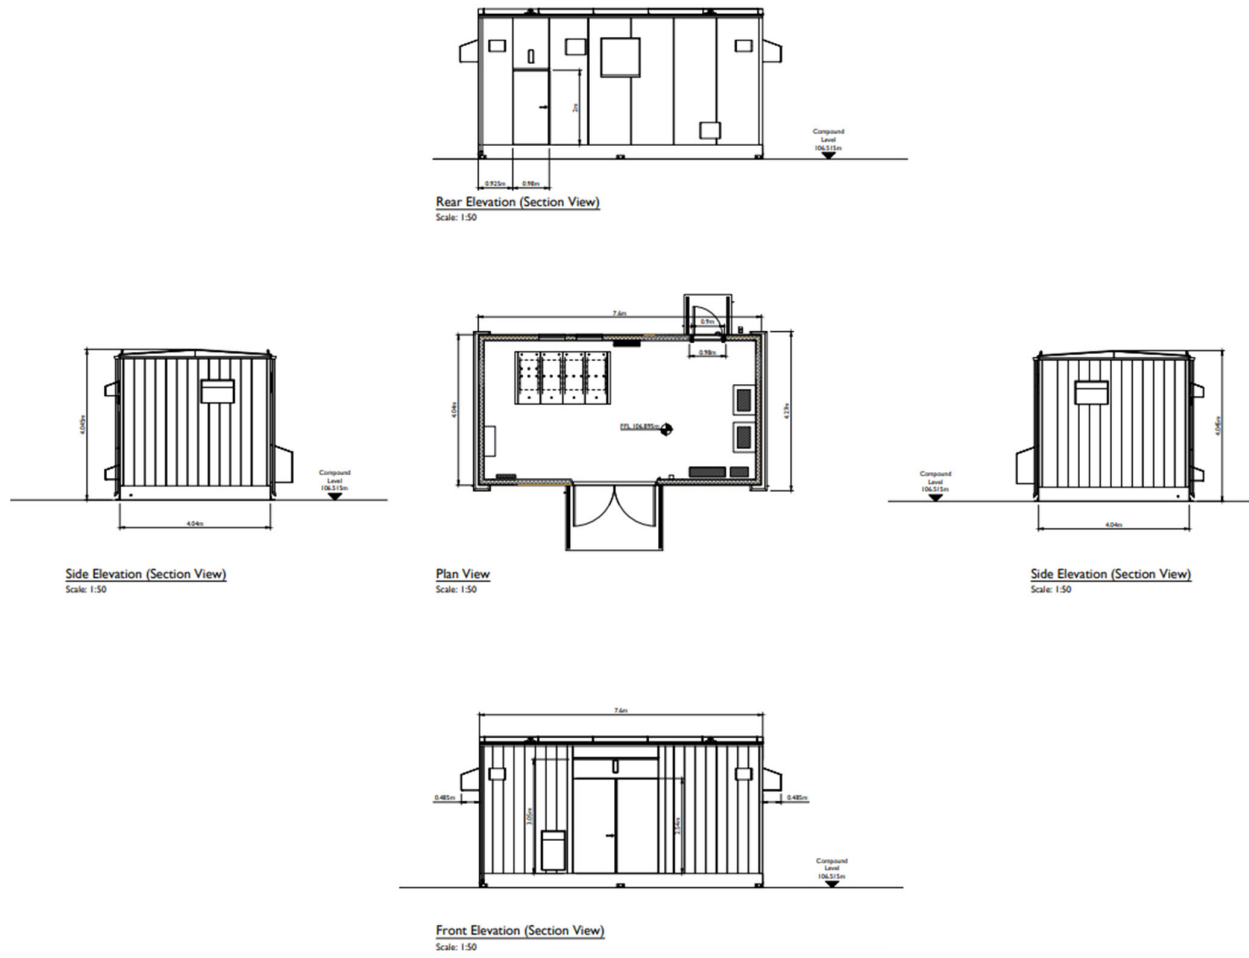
UTF Transformer Compound Modular Control Building Plan and Elevations
